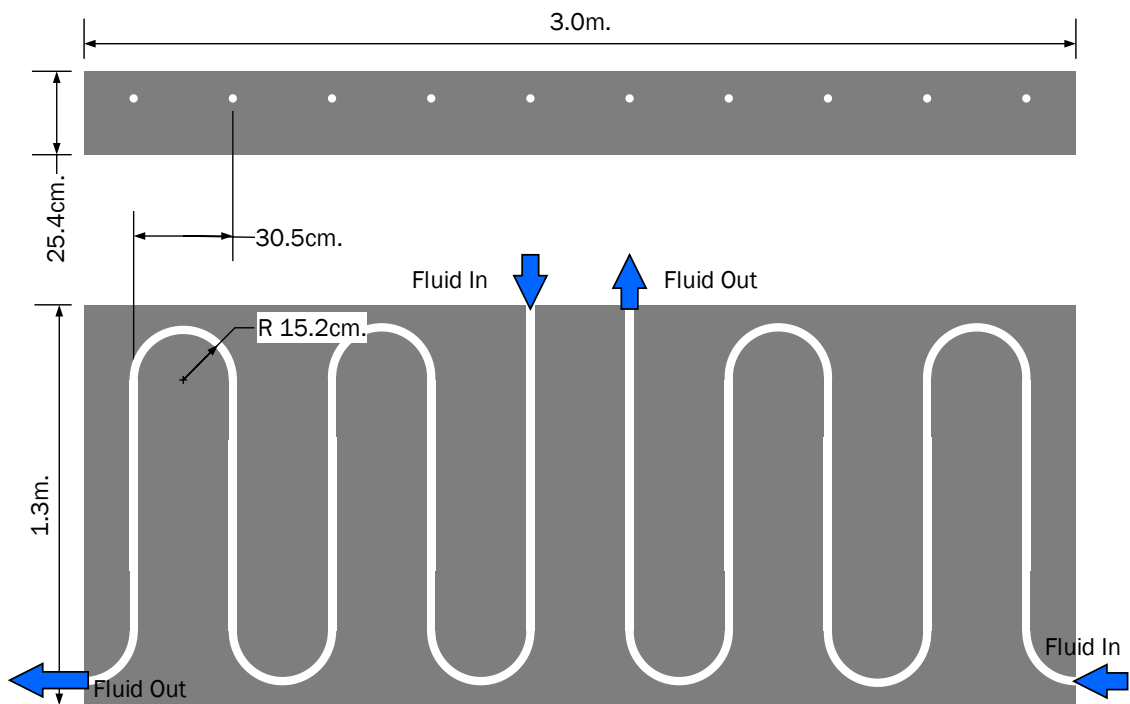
Plan view of the slab with circulation tubes spaced 30.5 cm (12 in) apart.
